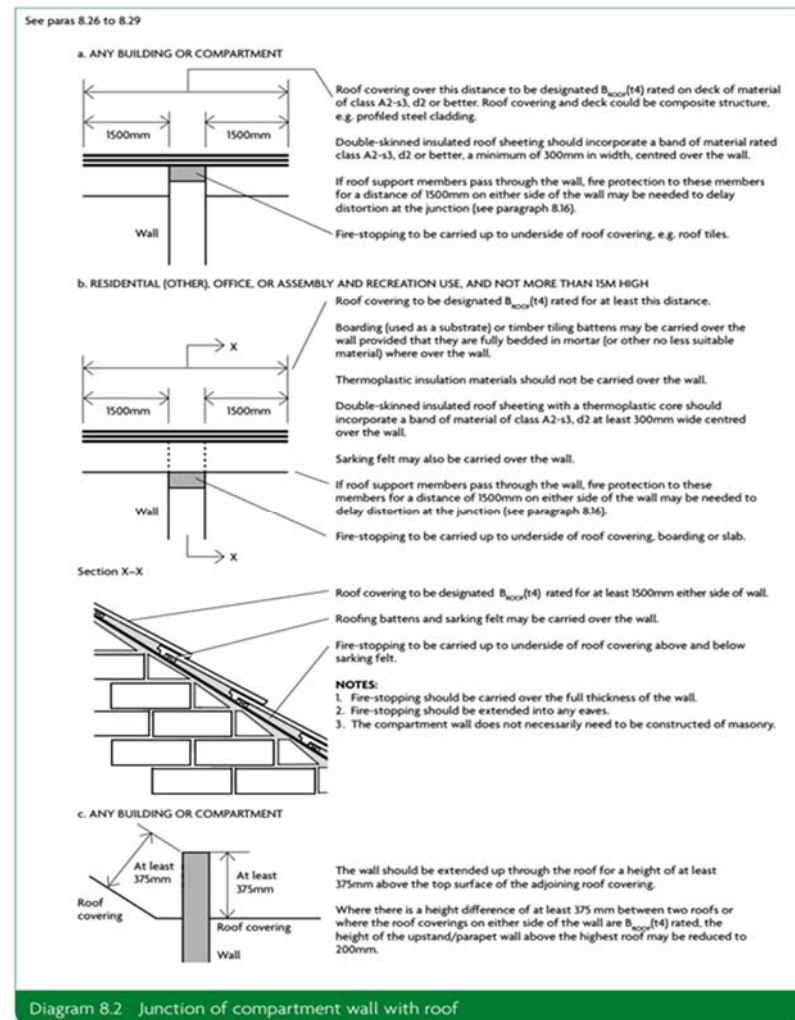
Junction of compartment wall with roof (ABD diagram 8.2)
